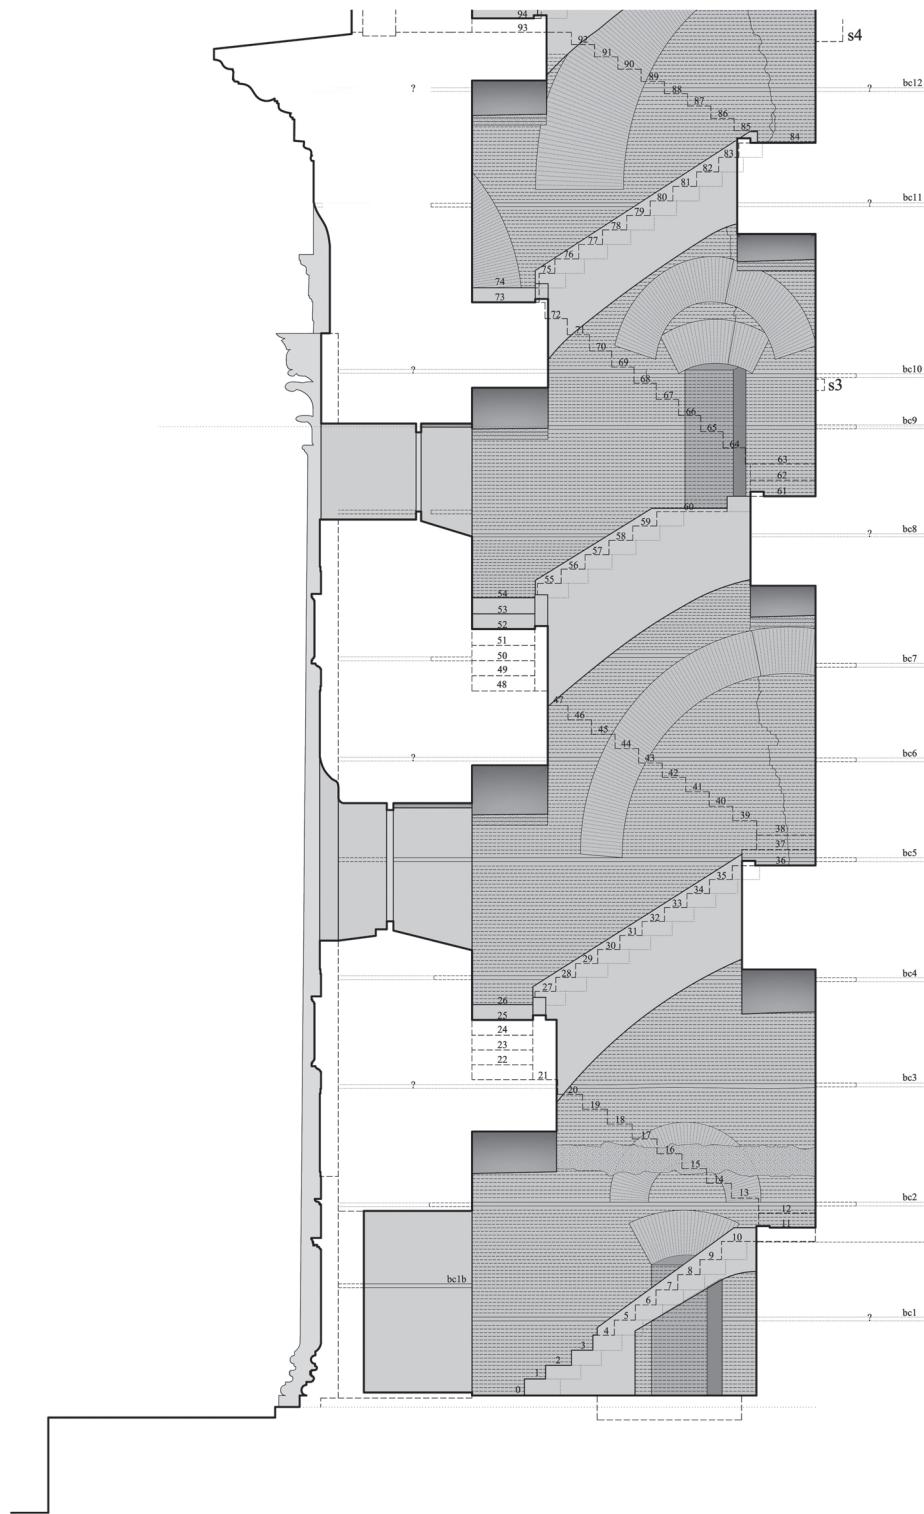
Detail section/elevation of the lower half of the East Stair, 1 : 100 (author and Robert Grover).
